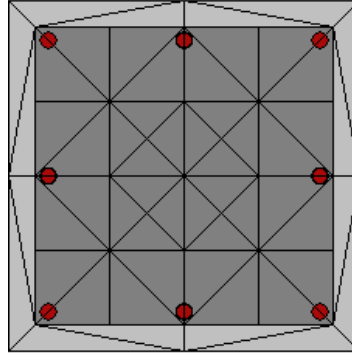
Rectangular column C 0.35x0.35 (8 No.16) fiber section for 8 story.
